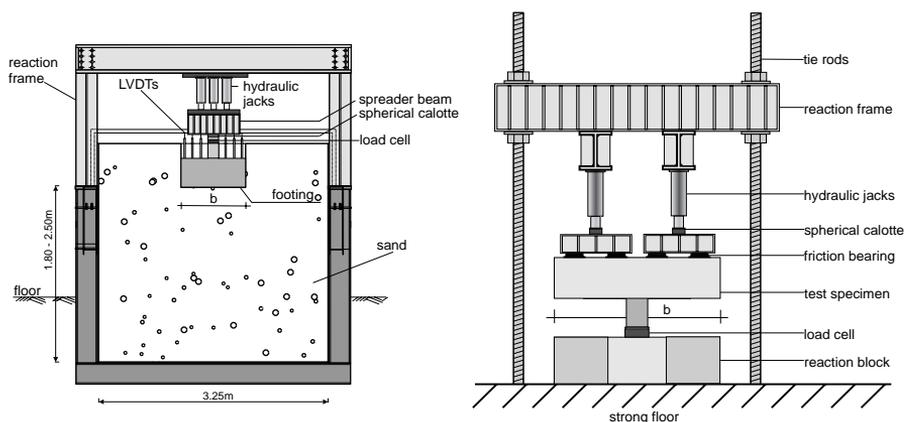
Test set-up for the tests on footings supported on sand (left) and for the test specimens charged with uniform surface loads (right)
